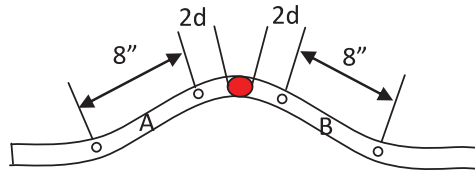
California Test 670 Hoop Weld Validation Sample (California Test 670)
